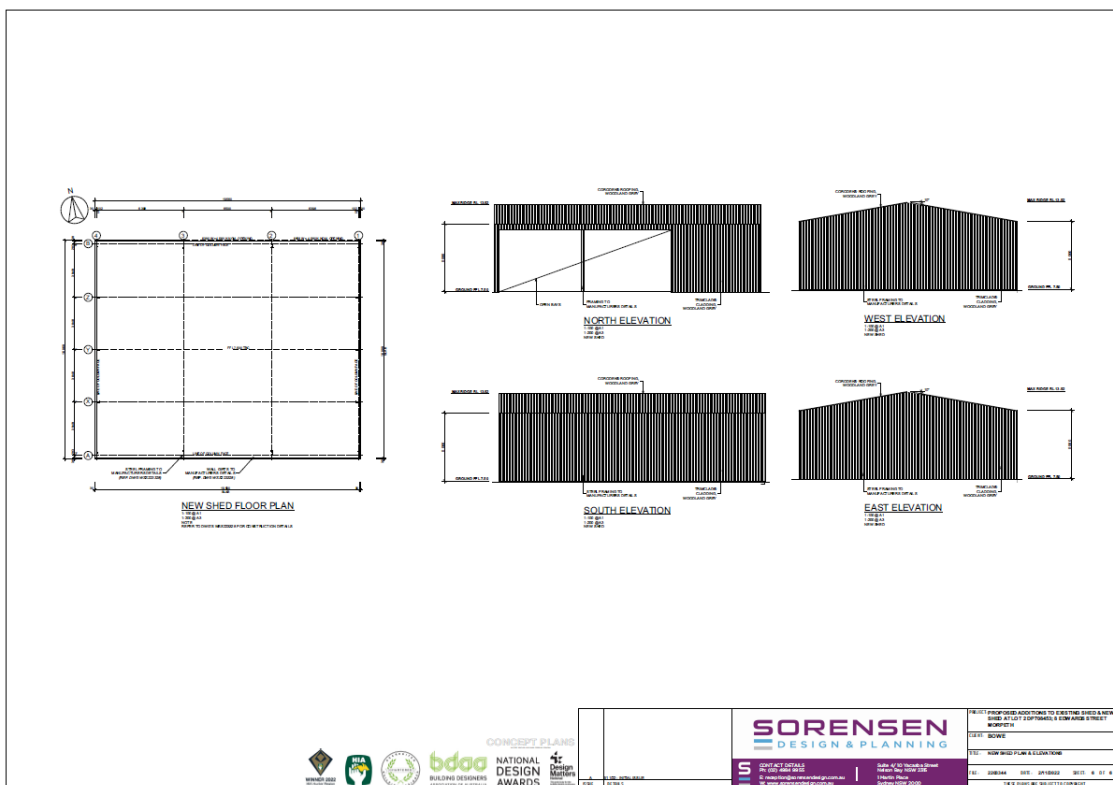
Proposed New Farm Building (Sorensen Design 2022)
